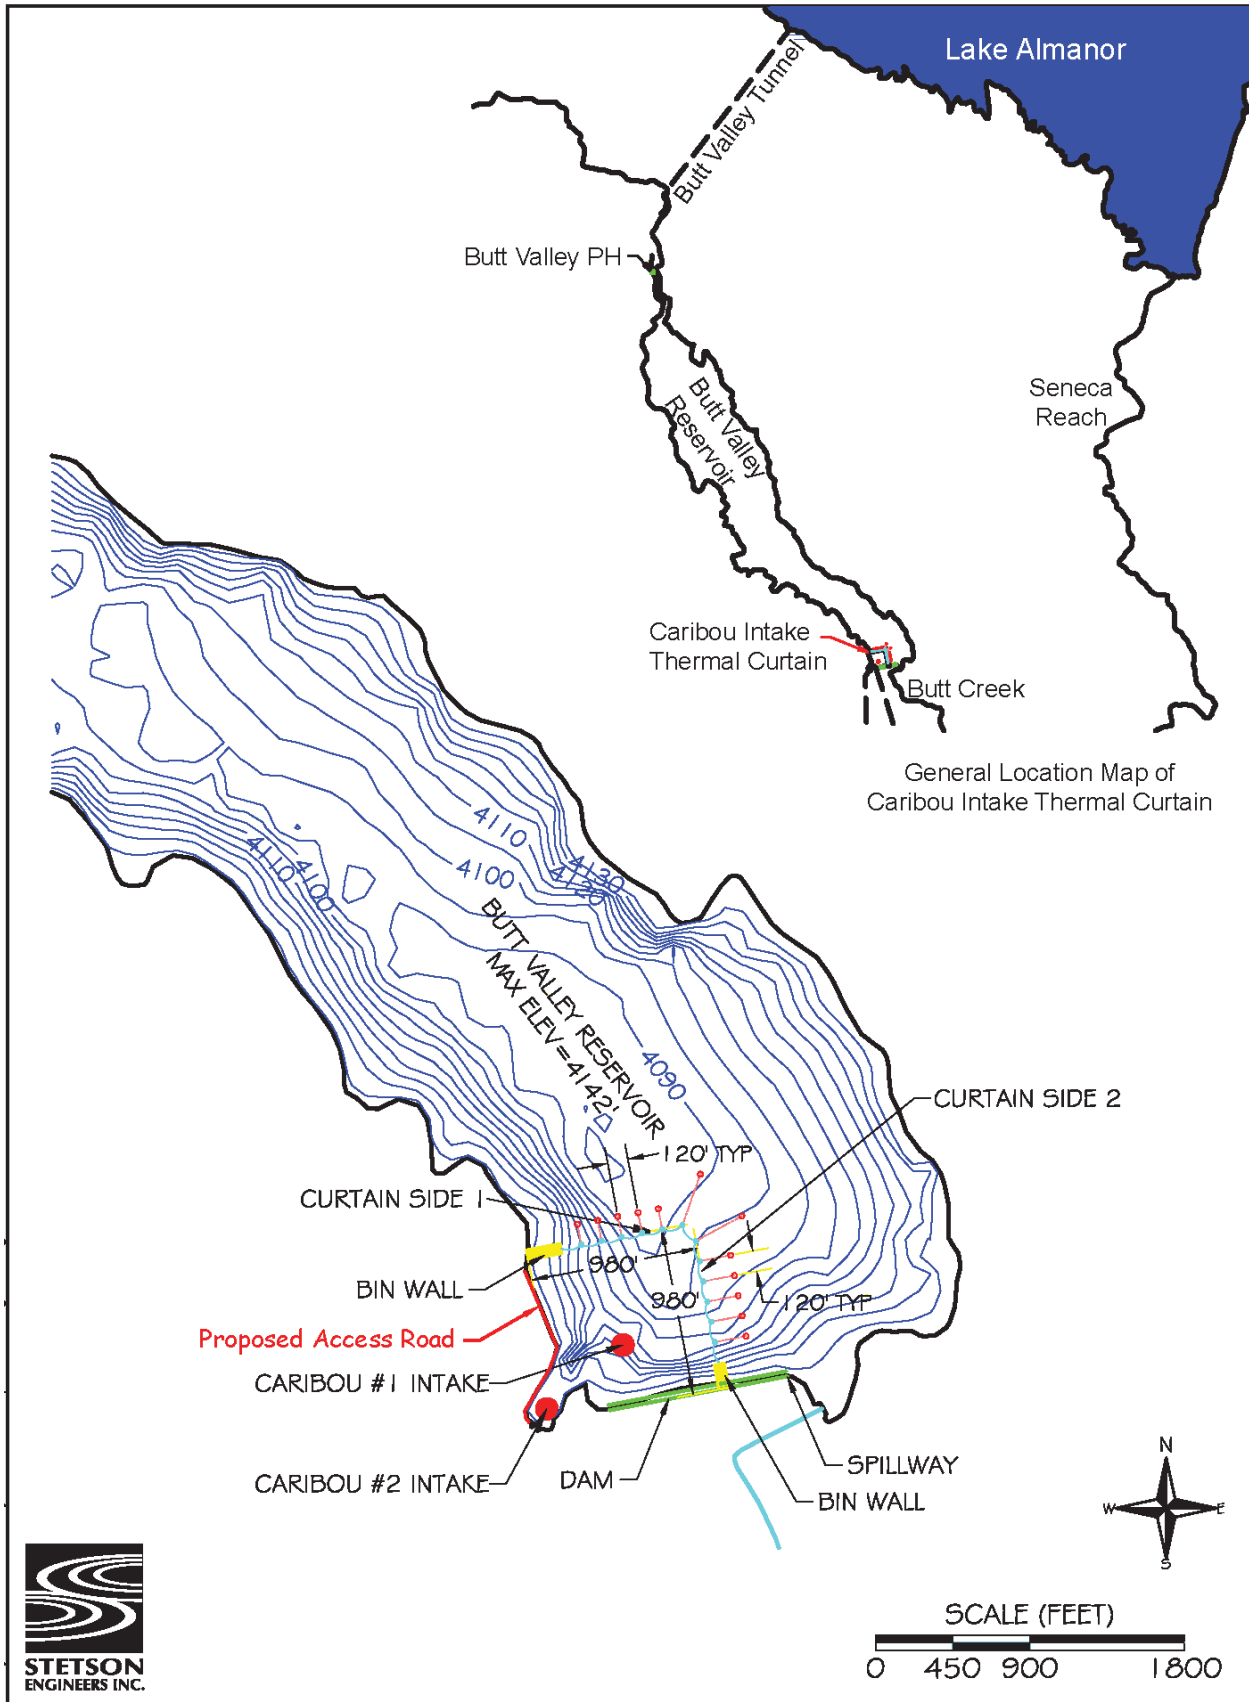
Plan View of Caribou Intakes Thermal Curtain
